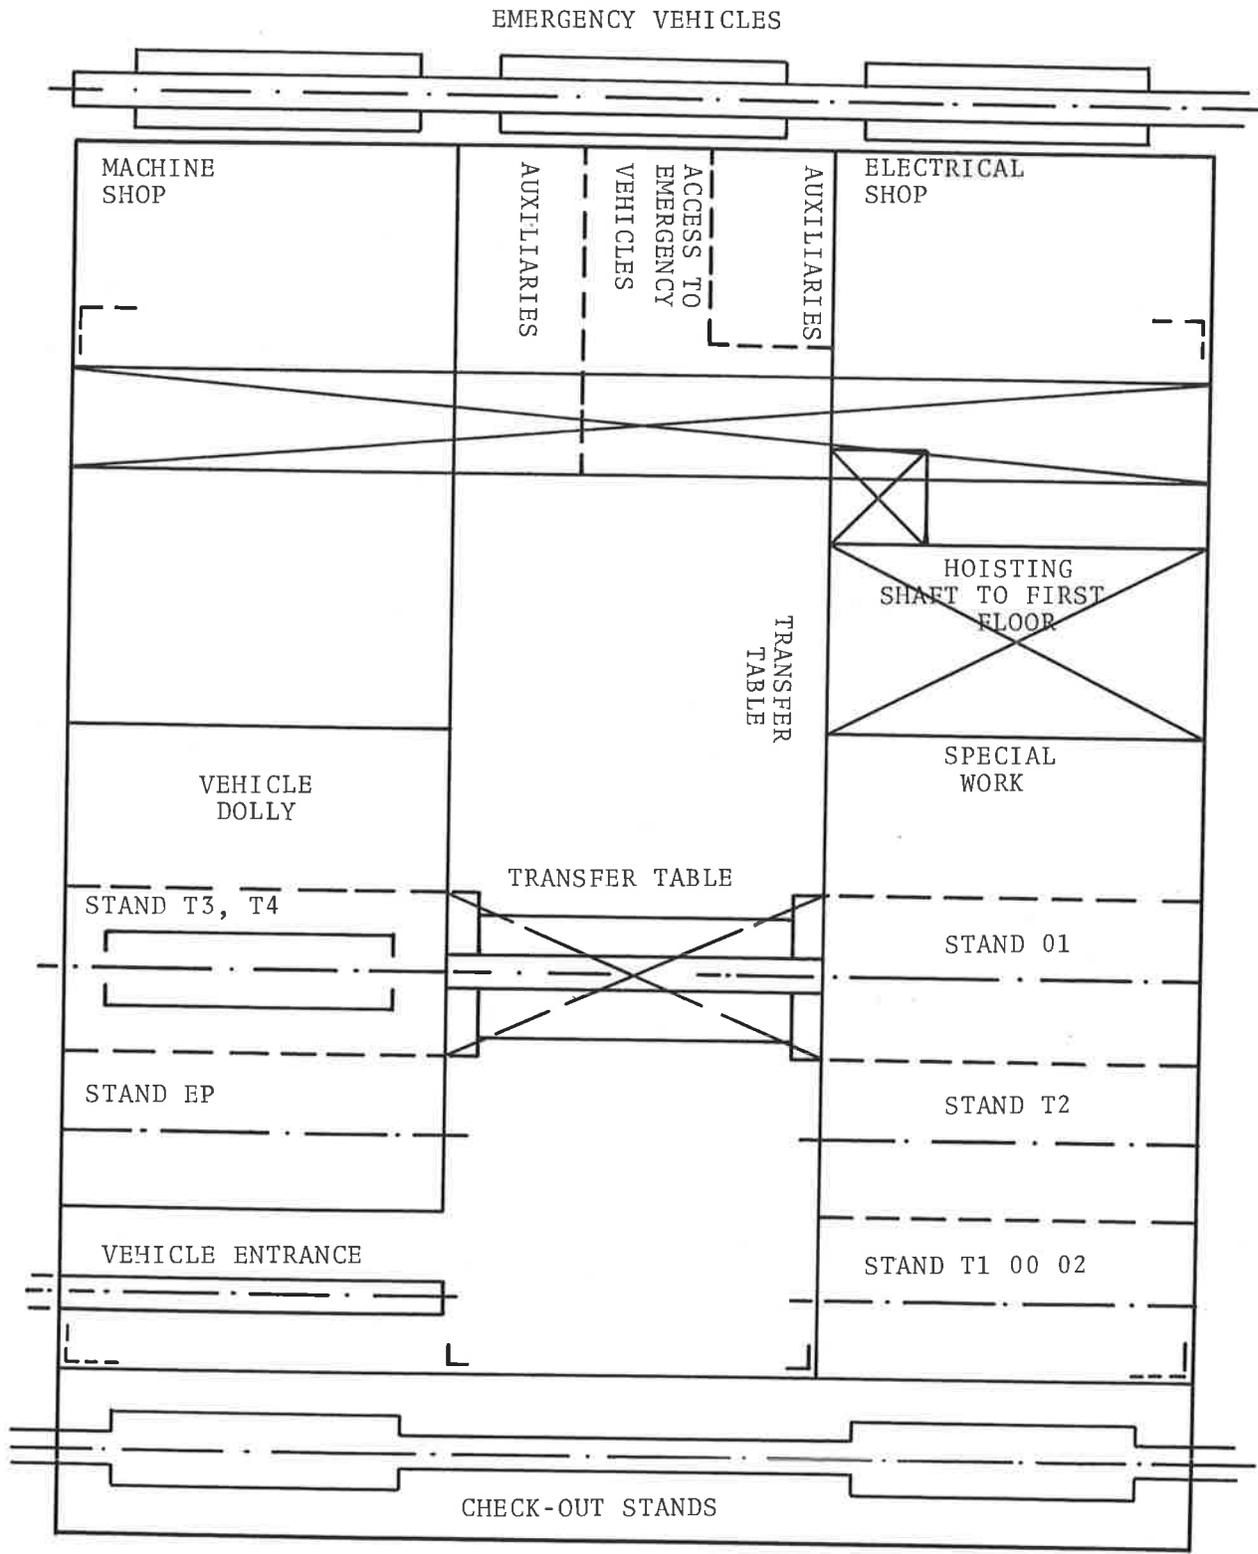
ERLANGEN MAINTENANCE FACILITY (SECOND FLOOR)
